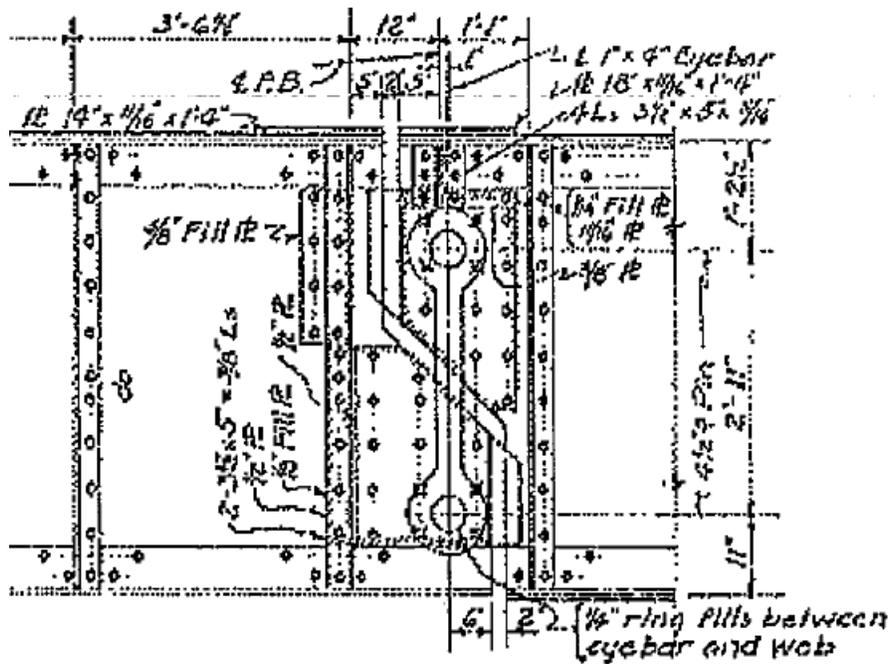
Wyoming DOT eyebar detail – 2156 (Fredrick, 2006)
